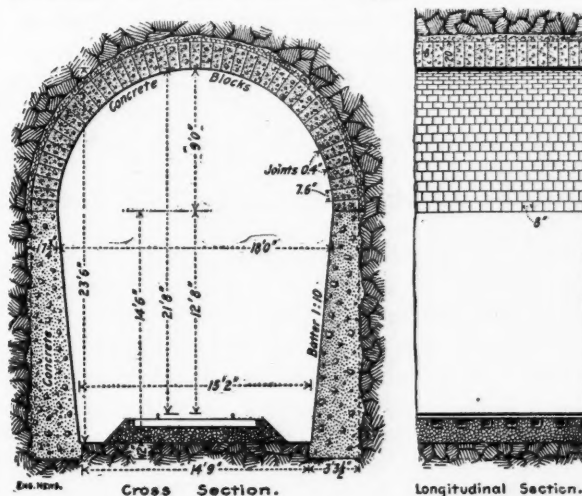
TUNNEL WITH ROOF LINING OF CONCRETE BLOCKS MEXICAN CENTRAL RY.
